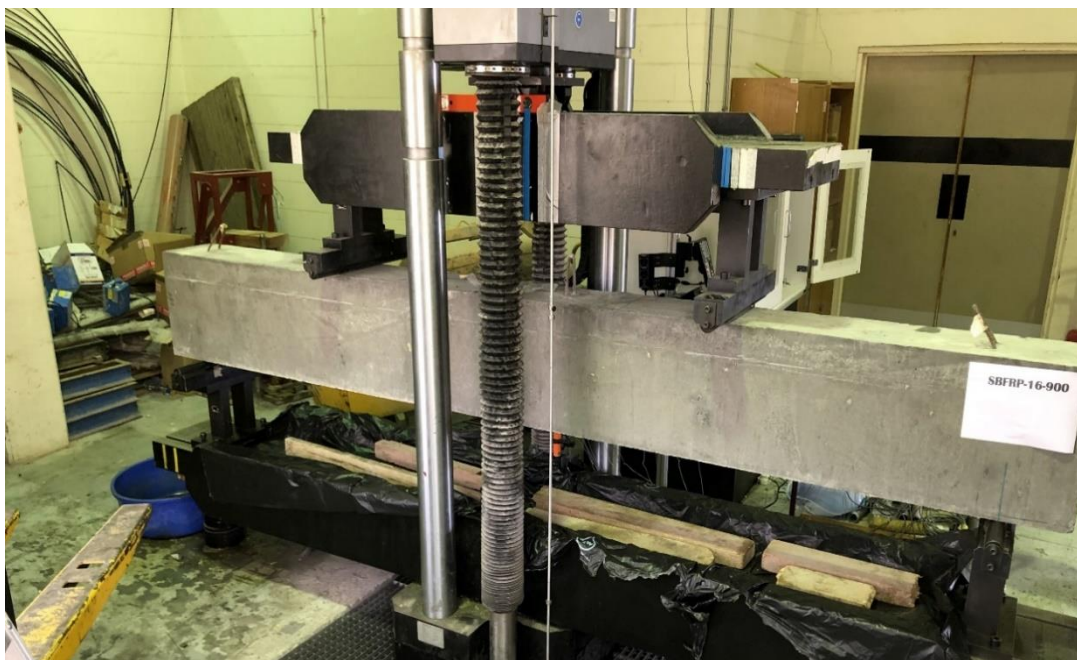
Beam 8 (SBFRP-16-900) testing setup
